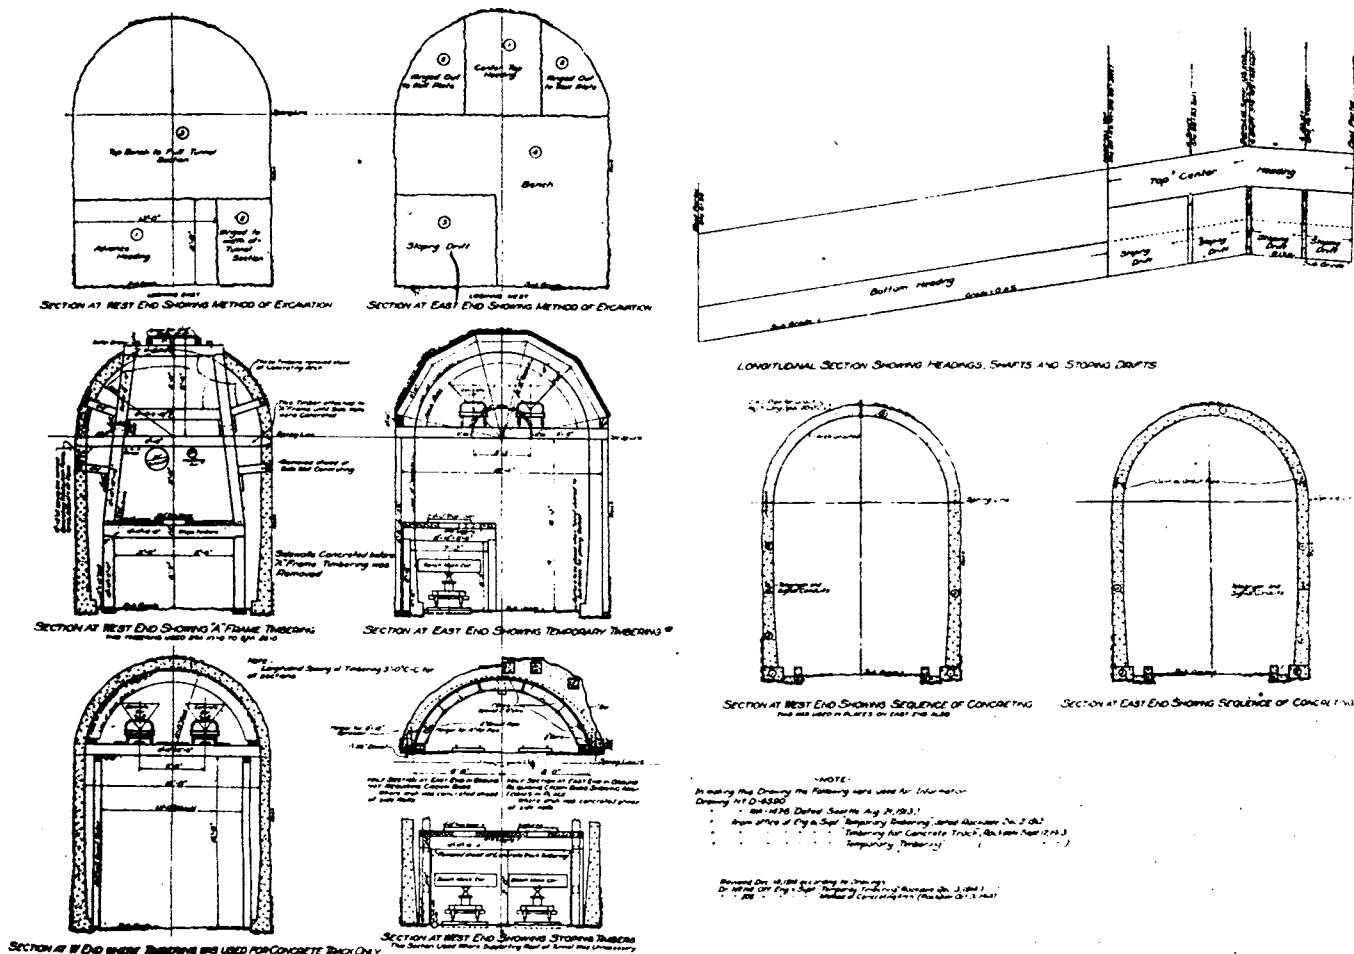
Timbering Schemes and Stages in Excavation and Construction, Snoqualmie Tunnel, C. M. & St. P. Ry.
